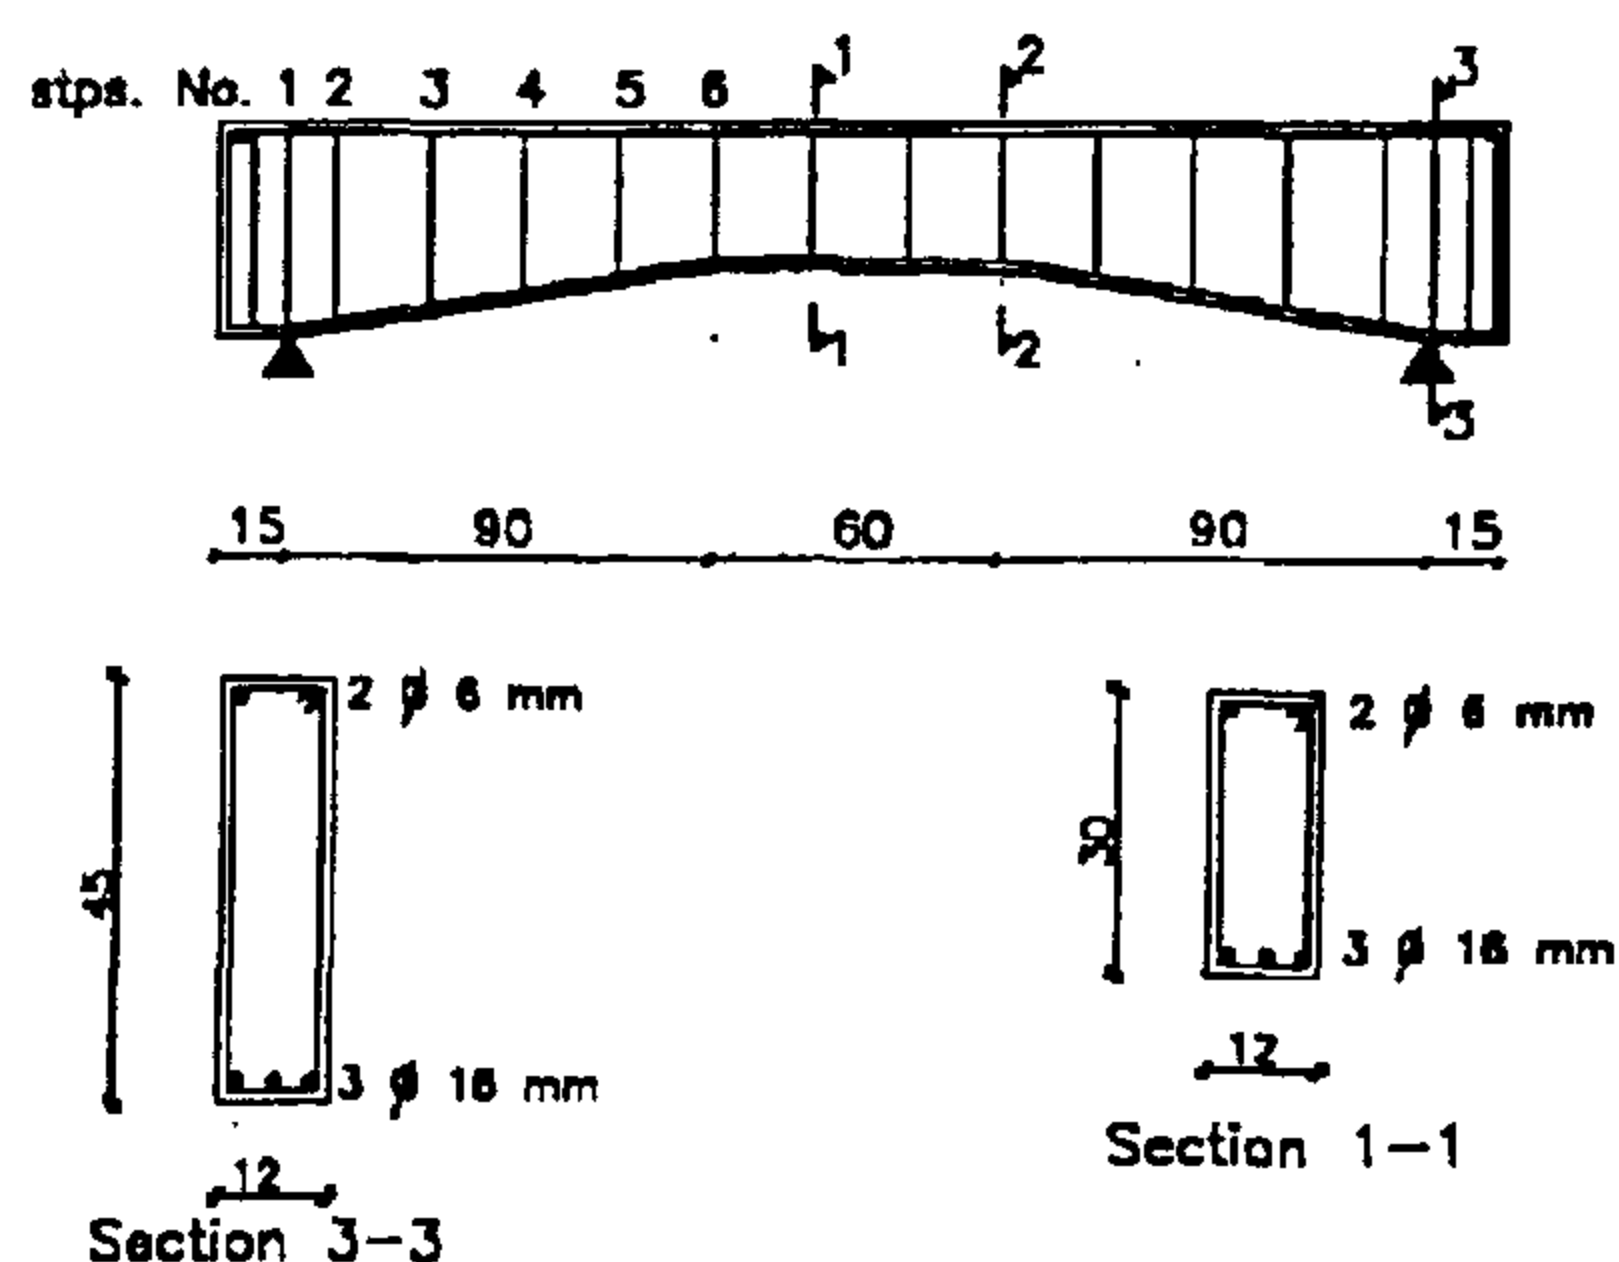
Beam geometry and reinforcement details for F1 [7]
